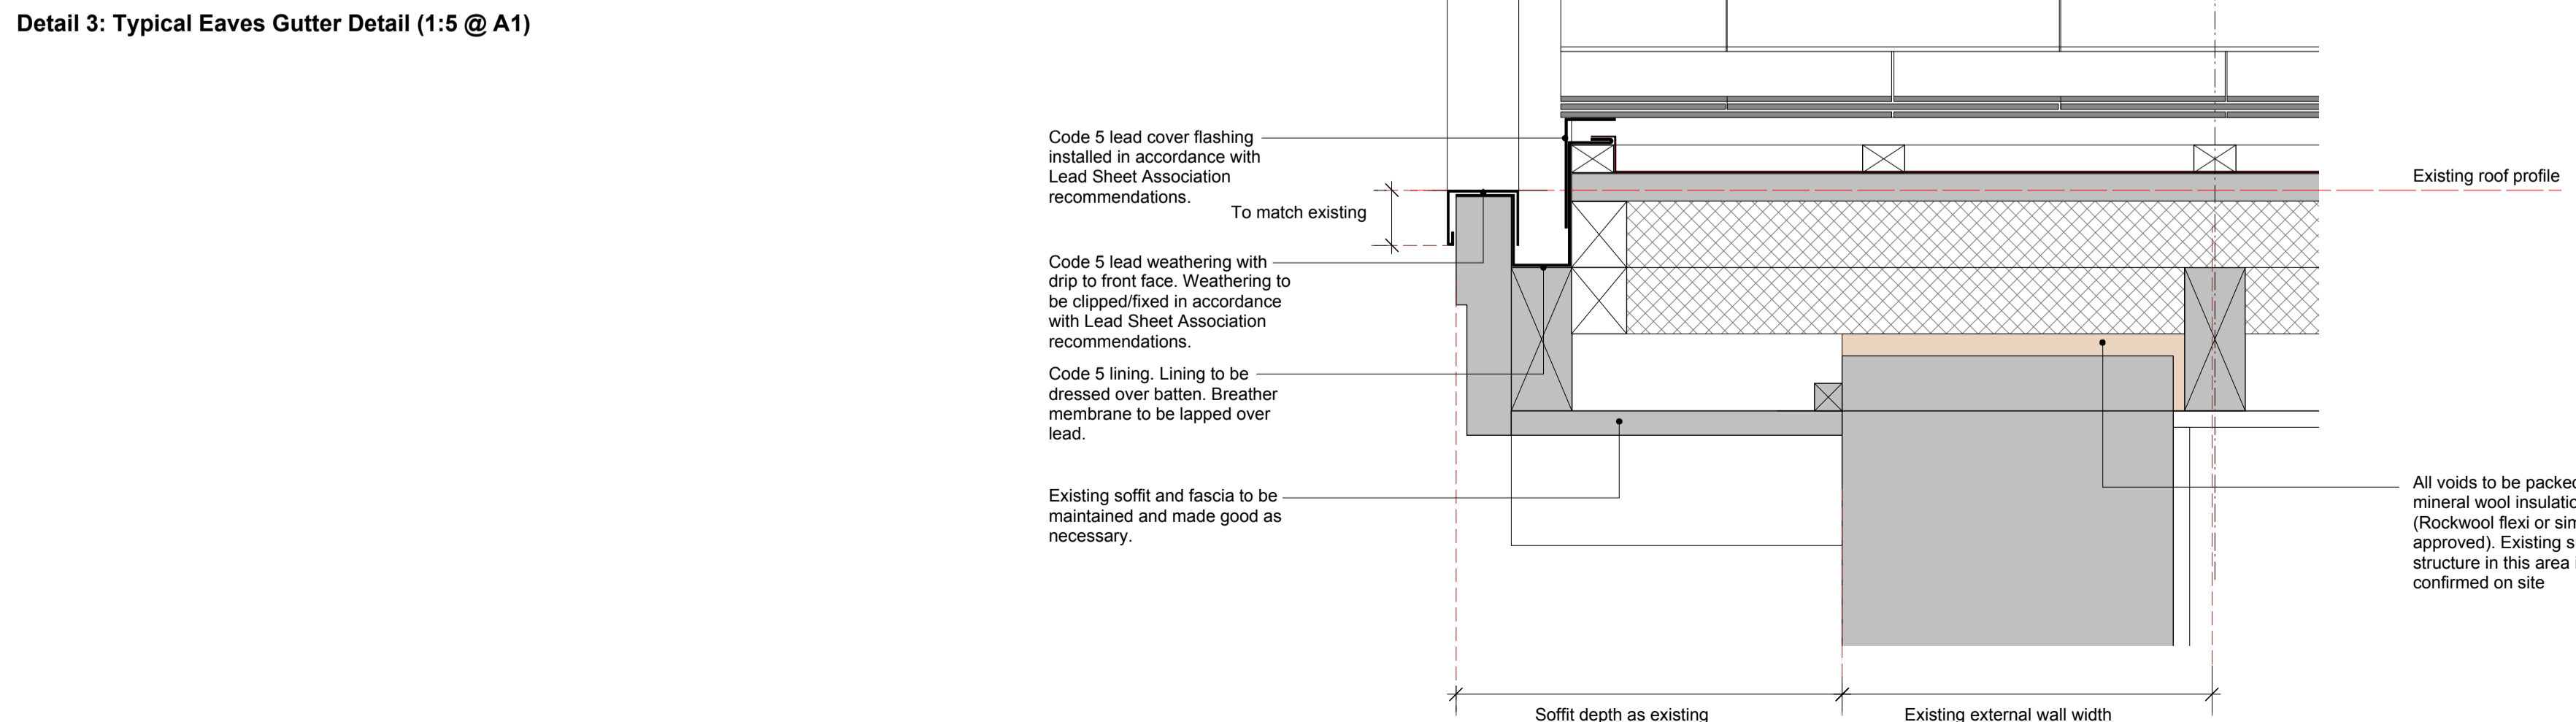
Typical Eaves Gutter Detail (1:5 @ A1)
